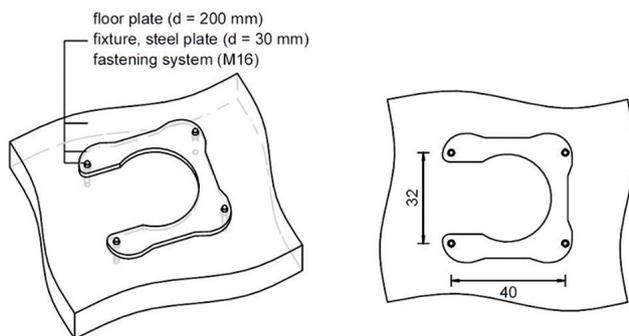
Fastening system for the fixture of the robotic machine (dimensions in cm unless otherwise noted).
